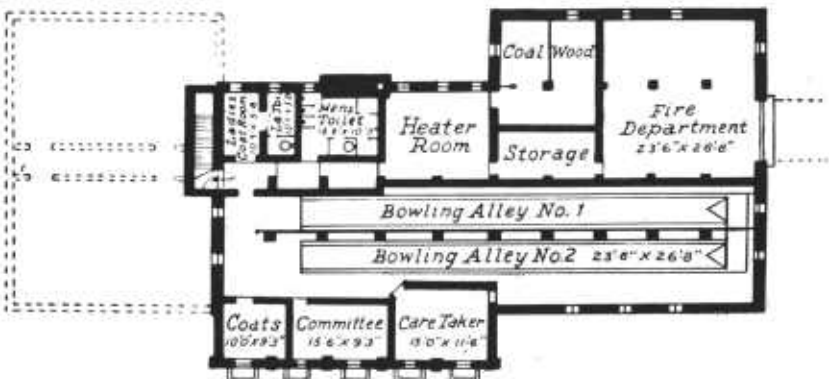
Basement plan of Locust Valley building. (By courtesy of Guy Lowell, architect.)
